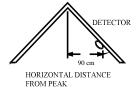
Recommended installation location for smoke & heat detectors in rooms with sloped ceilings or gables (slope >20 degrees).
